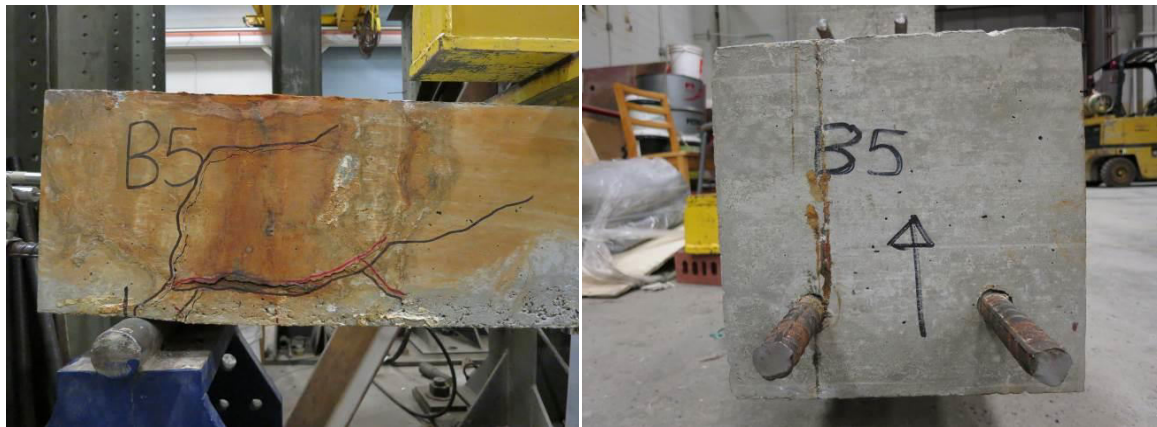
Typical bond failure of corroded beams (Left: anchorage cracking; Right: bars slip)
